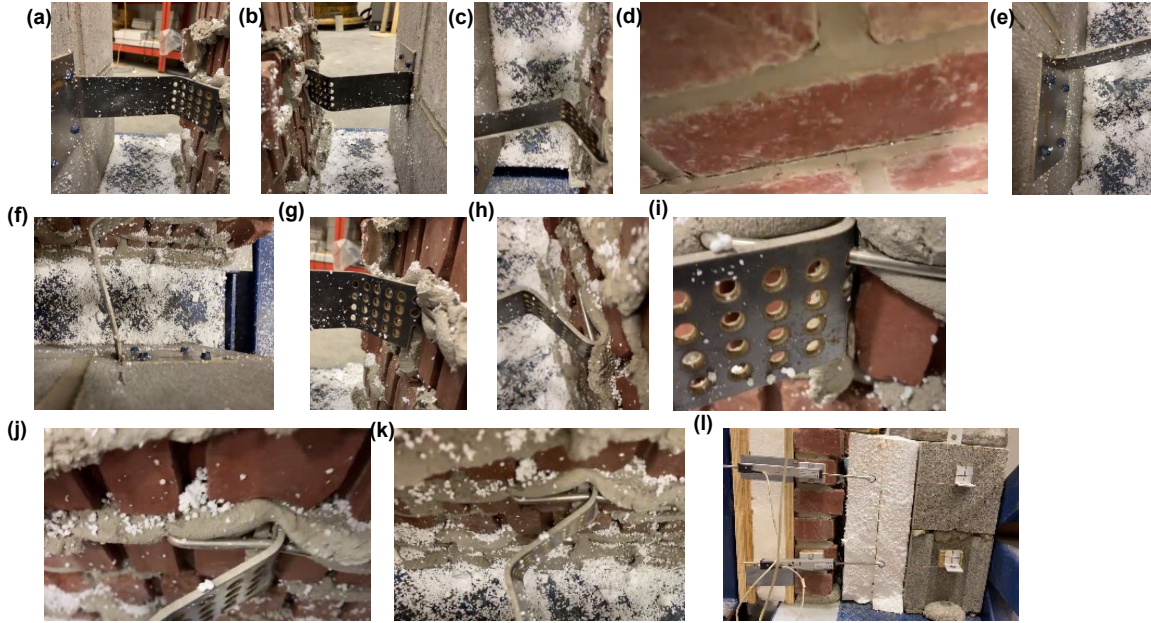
C-PV.CL-1 after testing of (a) side view, (b) alternative side view, (c) top view, (d) brick veneer outside face condition, (e) CMU connector Tapcon fastener interface view, (f) CMU connector Tapcon fastener interface view 2, (g) veneer connector interface view, (h) veneer connector interface view 2, (i) mortar joint condition view 1, (j) mortar joint condition view 2, (k) mortar joint condition view 3, (l) specimen view during testing
